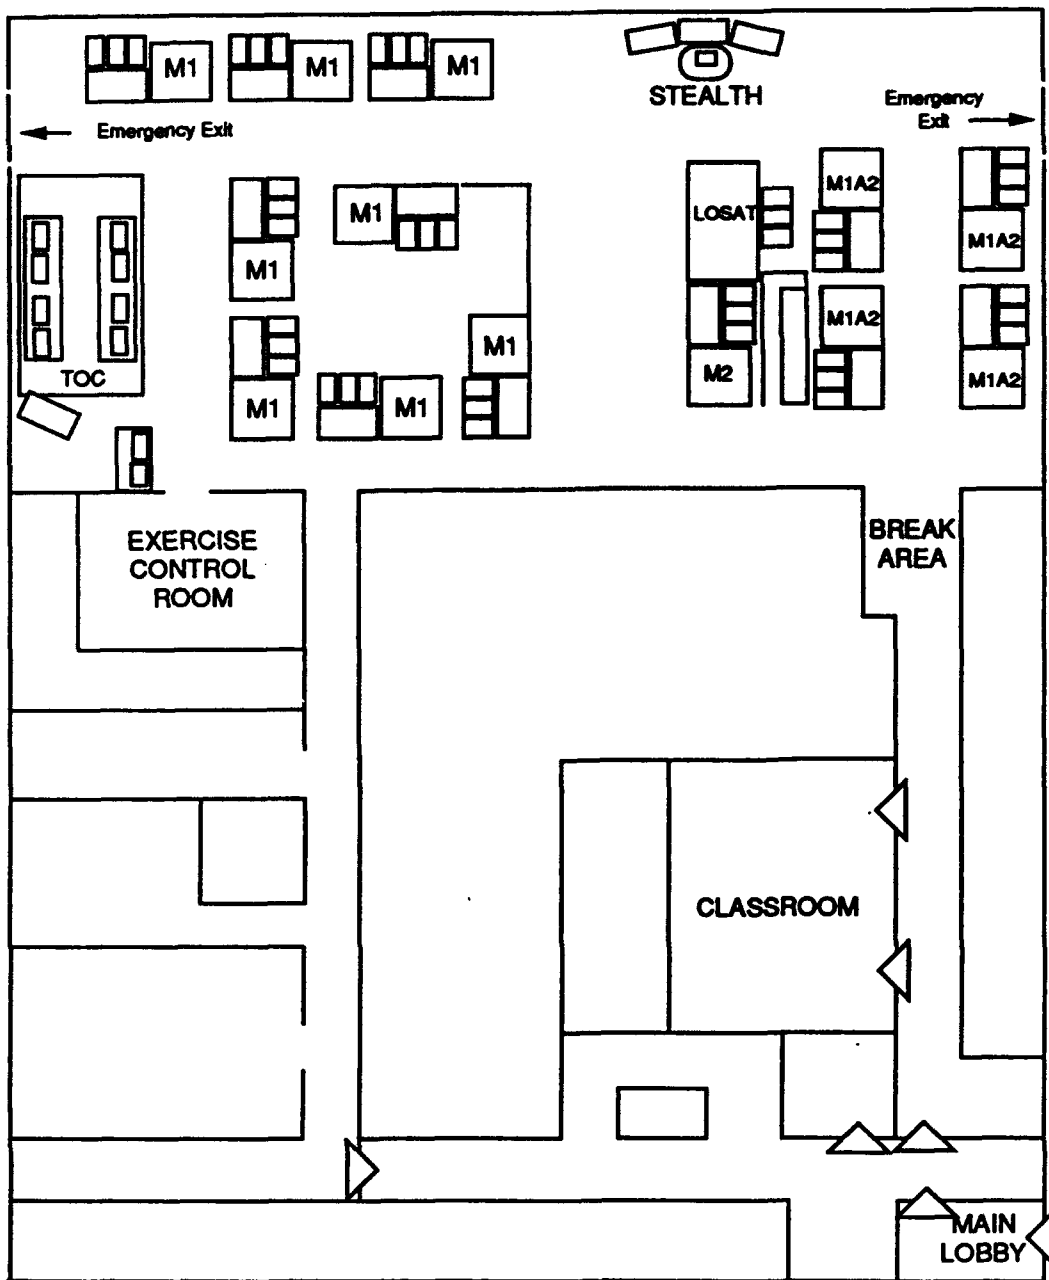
Floor plan of the Mounted Warfare Test Bed.
